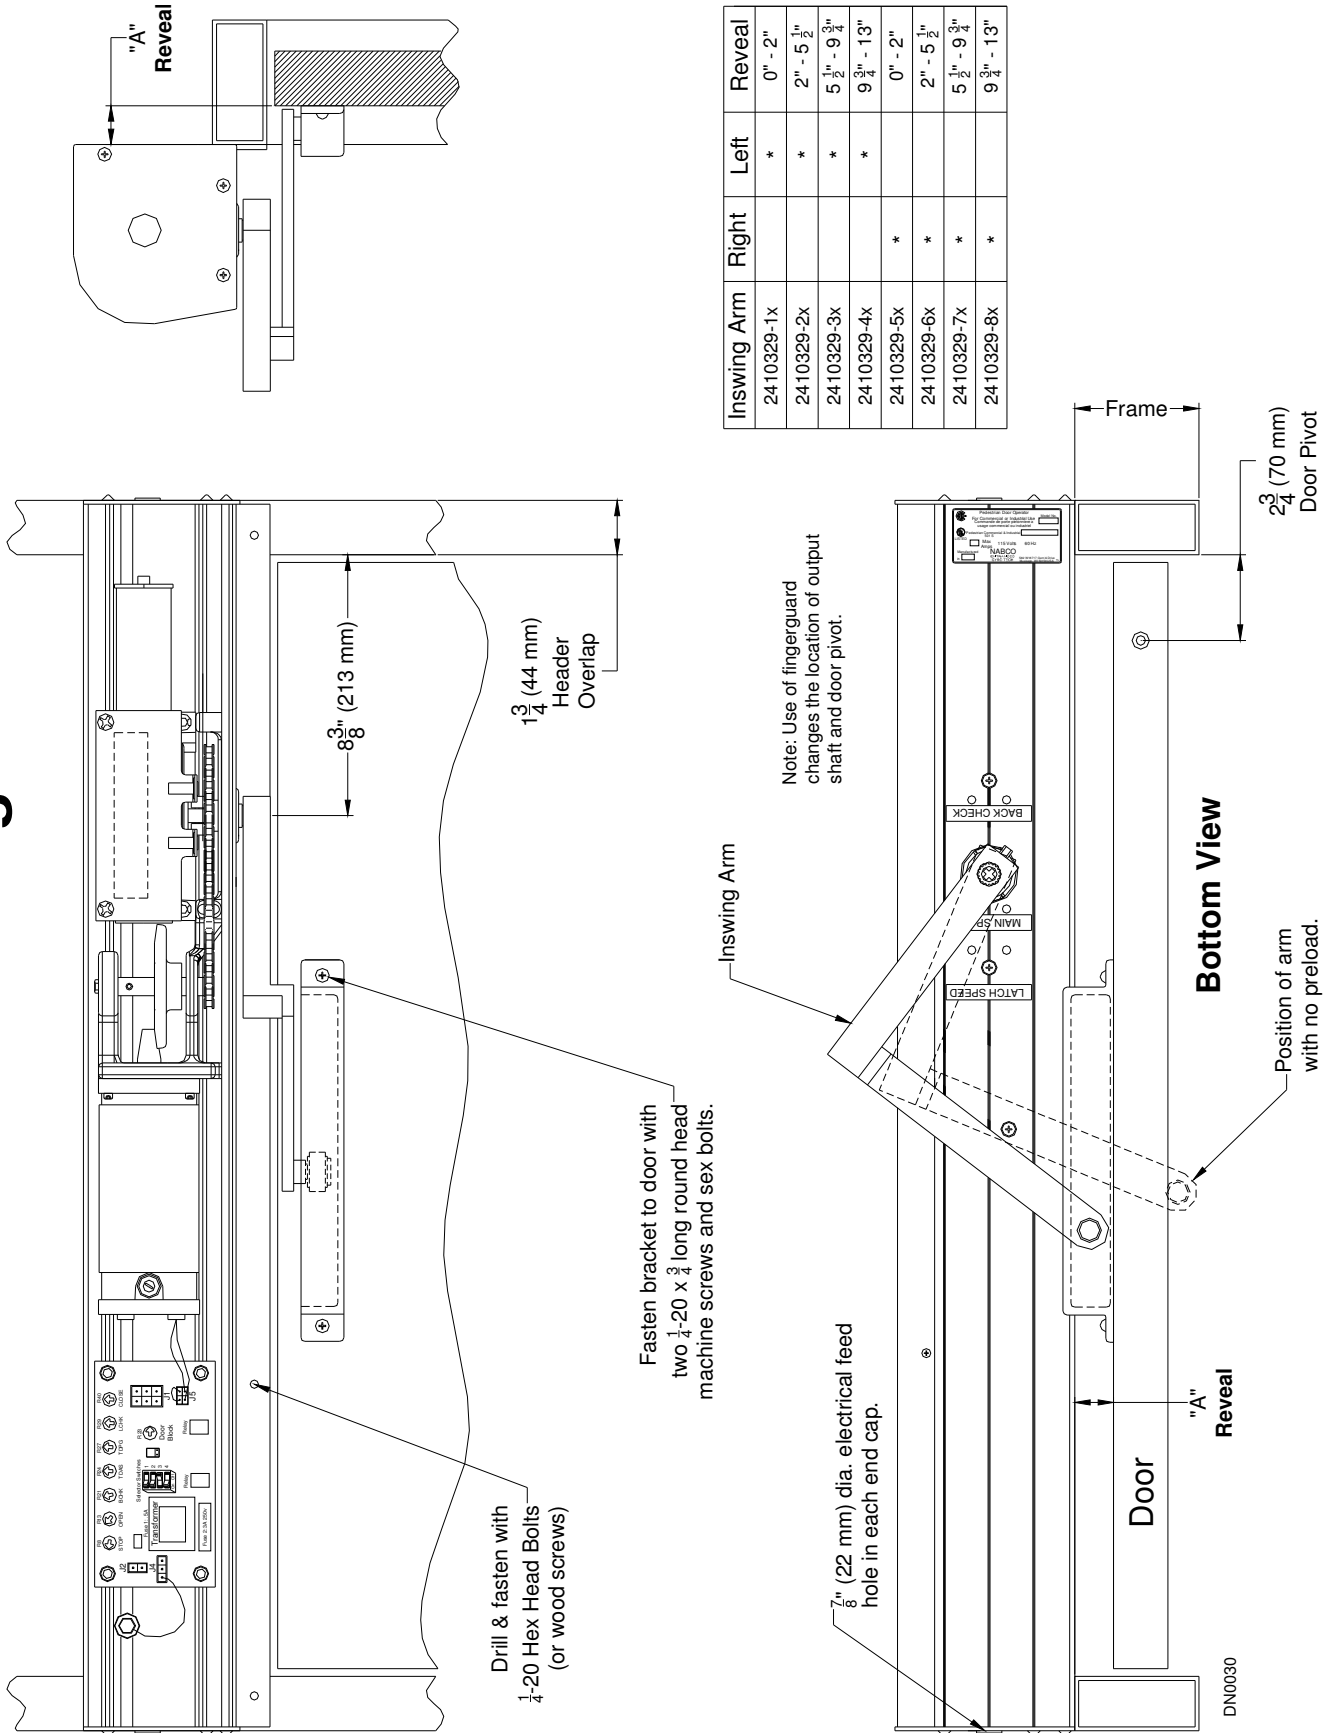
Installation Details, Left Hand Inswing Butt Hinge
